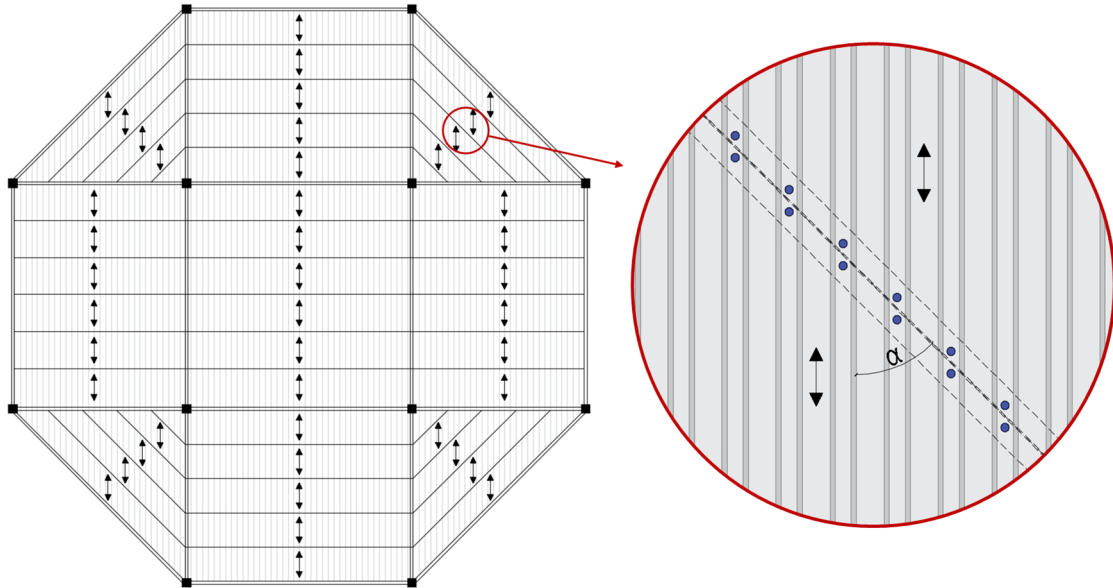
Example of the building floor layout with various profiled sheeting orientations.
